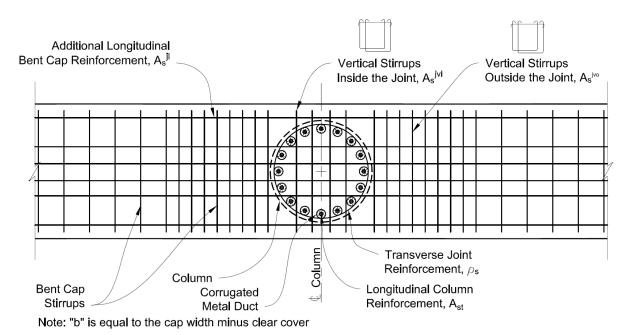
Grouted Duct Full Ductility Joint Shear Reinforcement Details (Plan)—SDCs C and D
